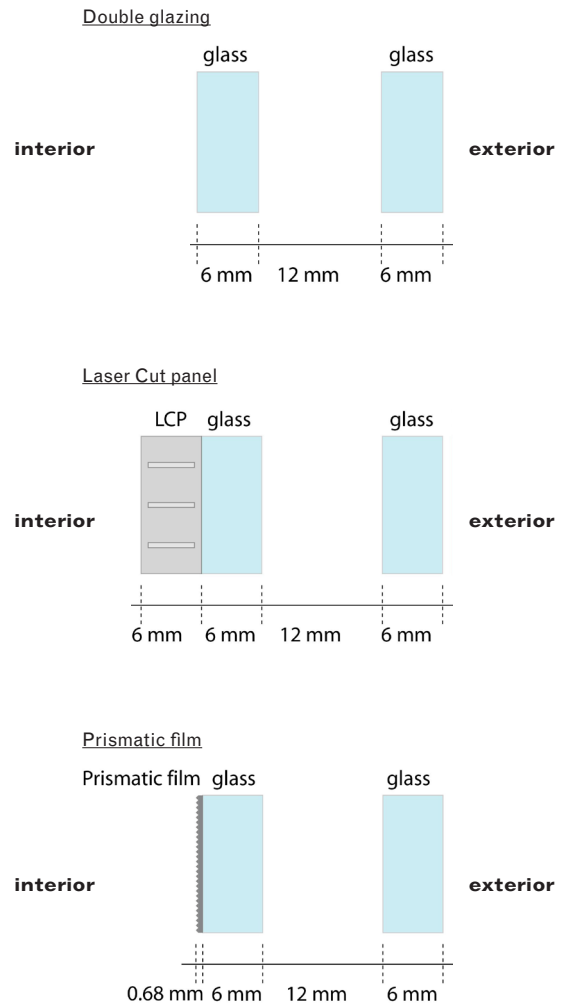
Sections of double glazing, LCP and Prismatic film
